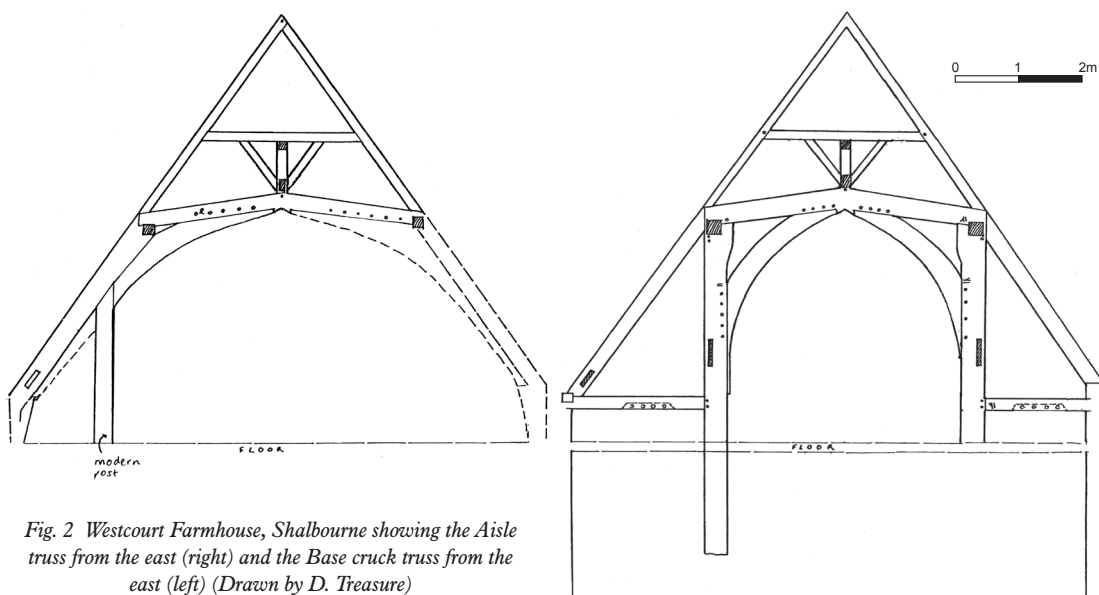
Westcourt Farmhouse, Shalbourne showing the Aisle truss from the east (right) and the Base cruck truss from the east (left) (Drawn by D. Treasure)
